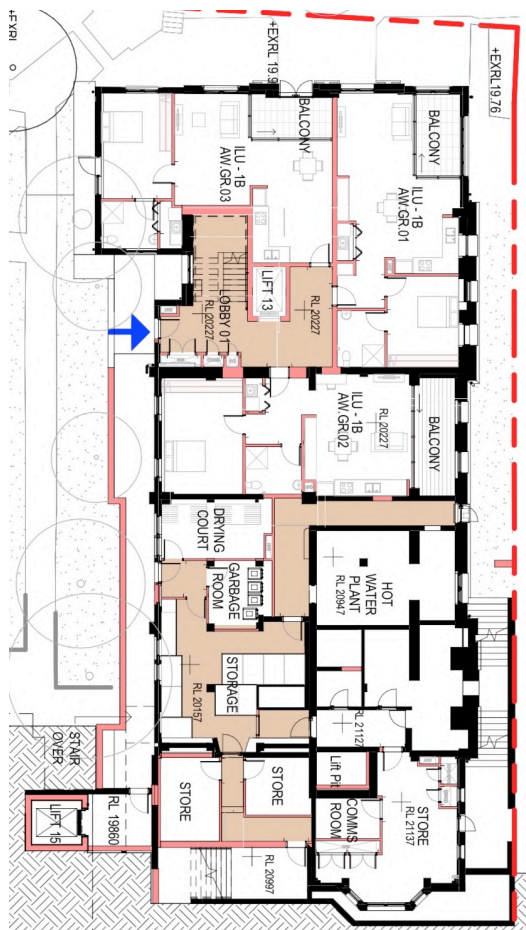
Lower Ground Floor Plan as Proposed
